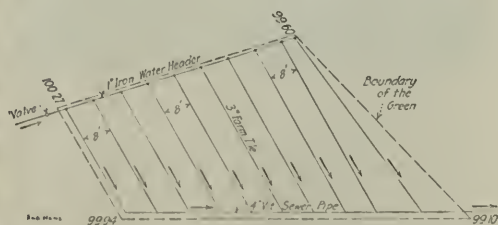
PLAN OF GOLF GREEN, WITH SUB-IRRIGATION AND DRAINAGE SYSTEM; PARK DEPARTMENT, ST. LOUIS, MO.
